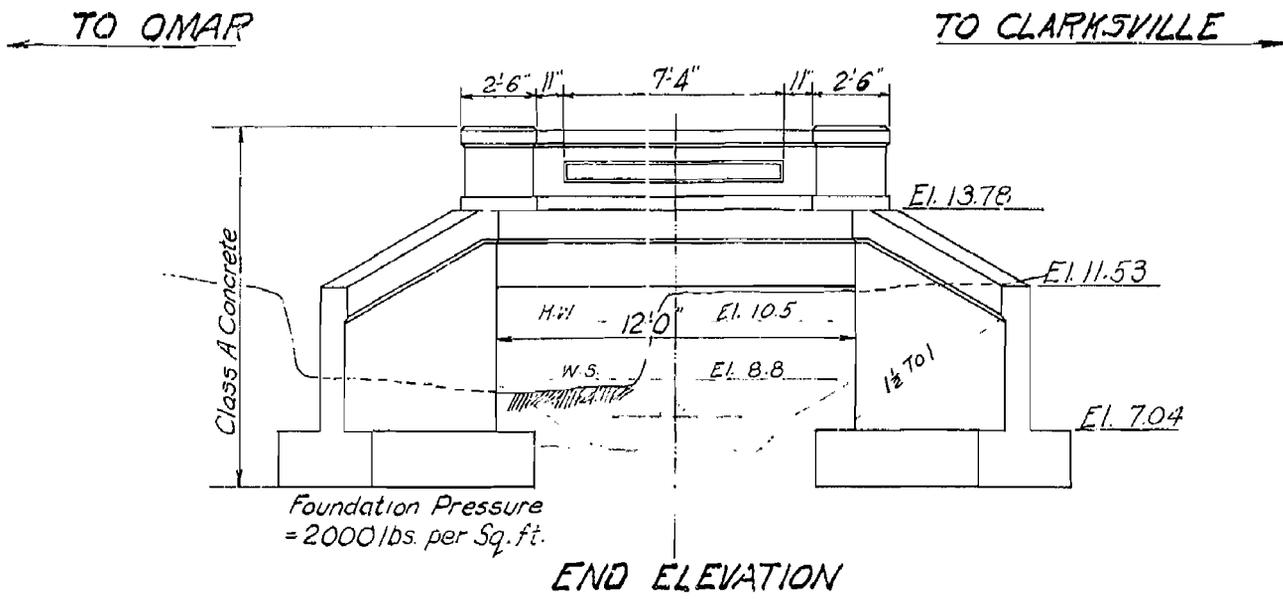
Bridge 447, Elevation and Typical Section (Delaware State Highway Department 1924)
